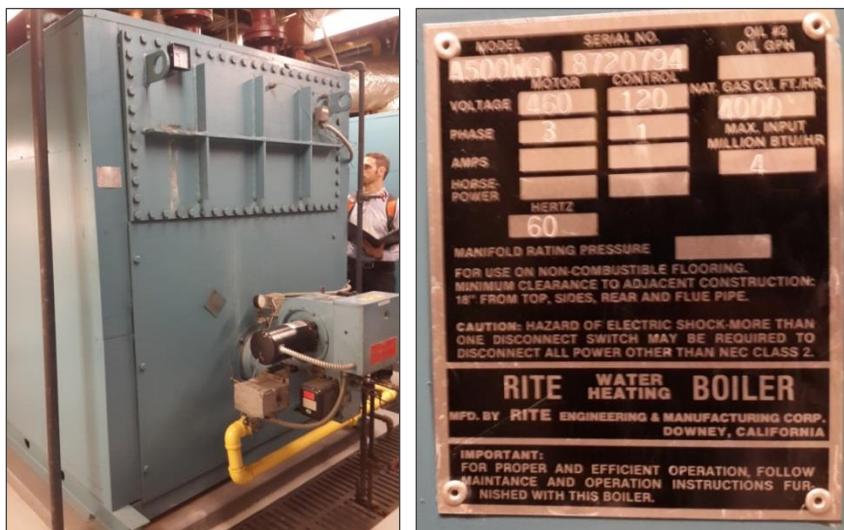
Building 1 Boiler Room: High Pressure Steam Boilers (Left), Heating Hot Water Boilers (Right)
